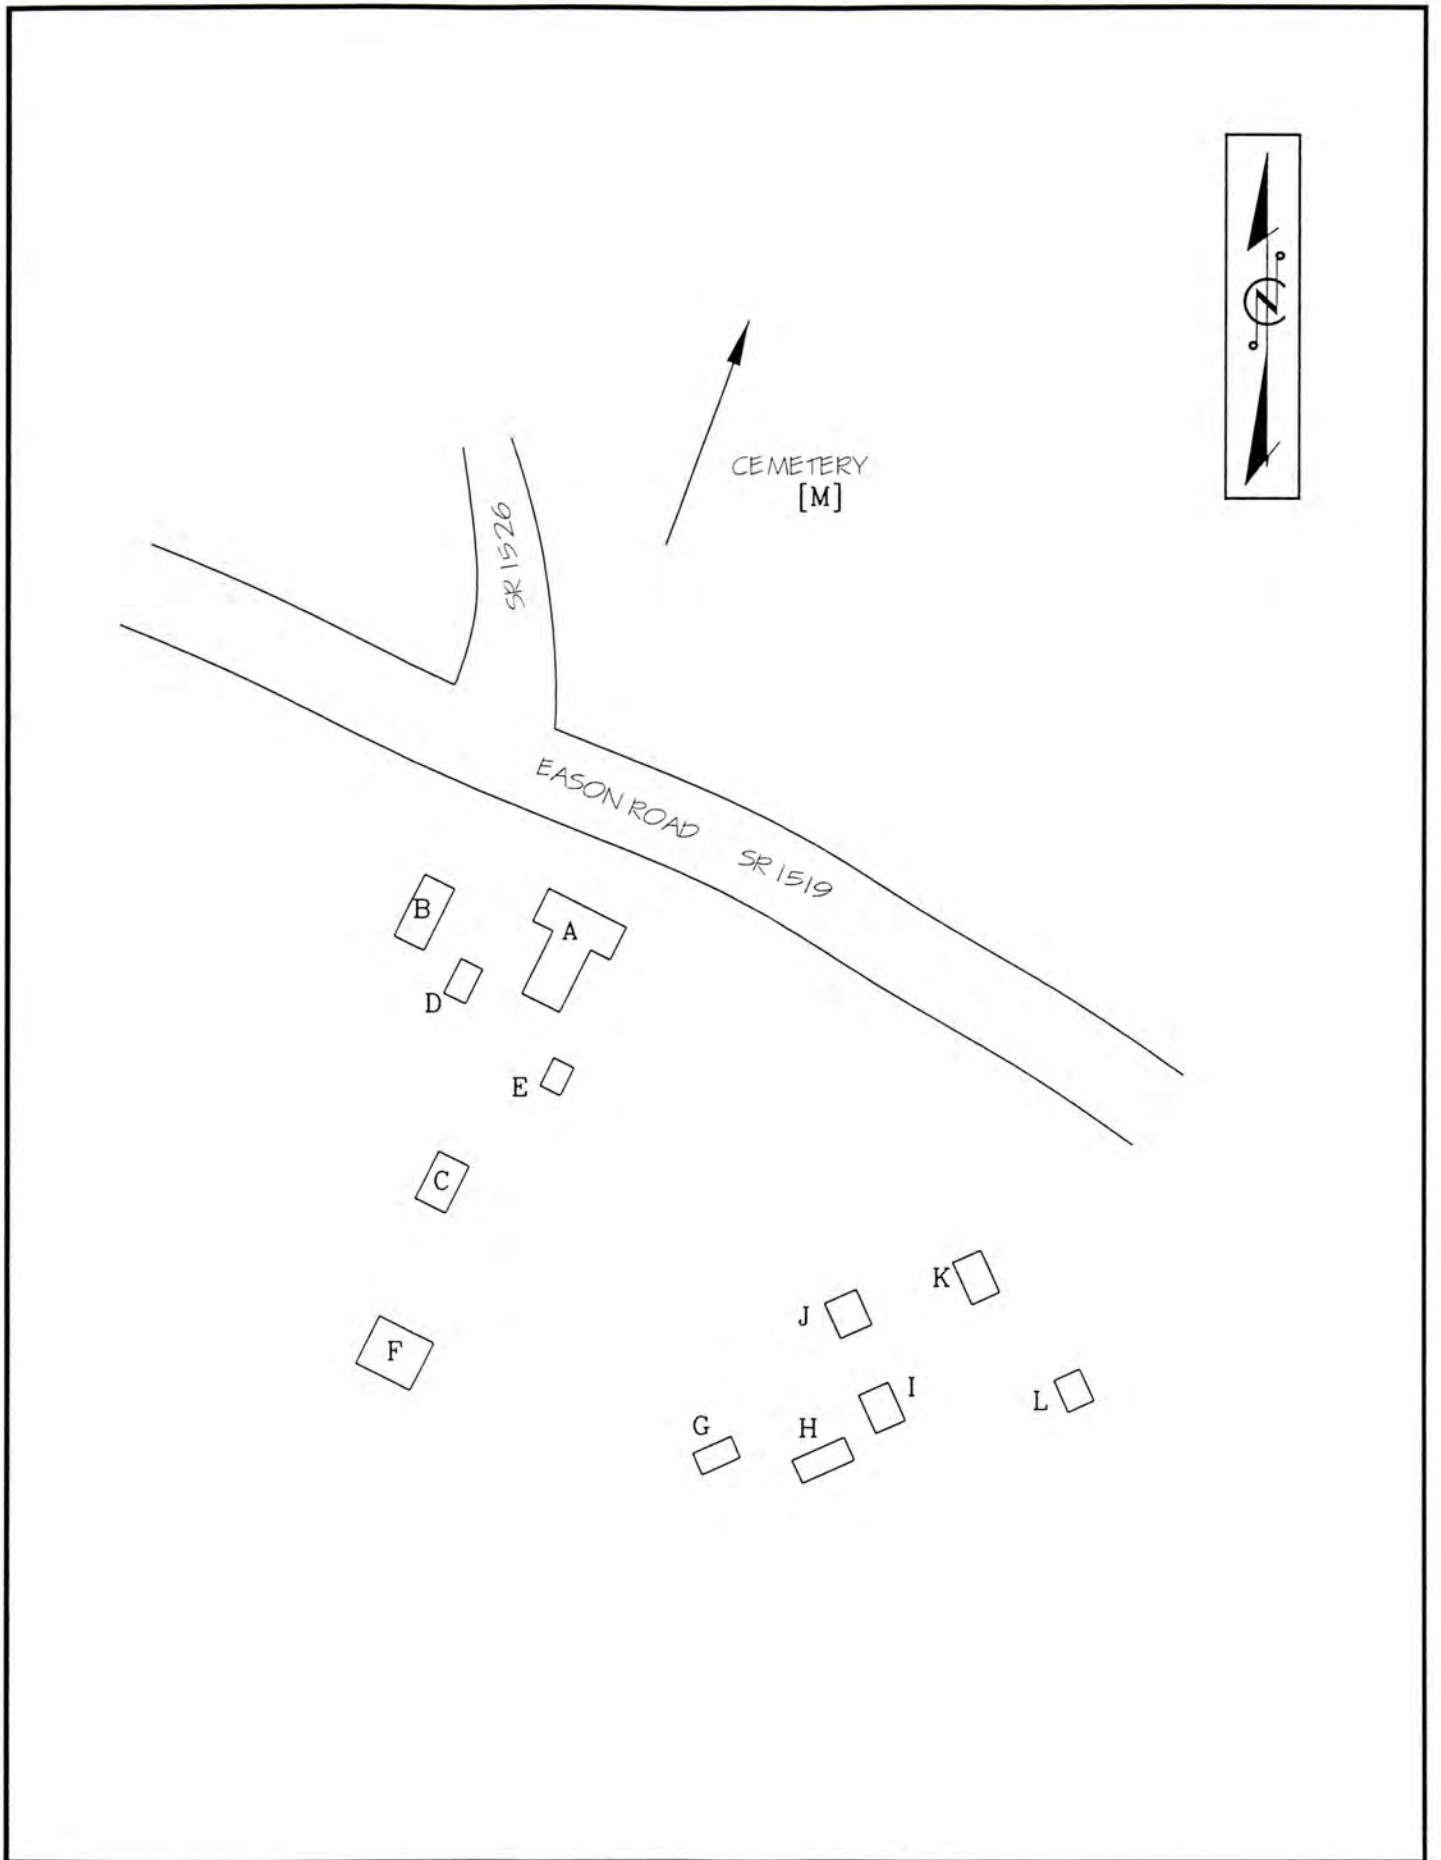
Munfred Brewer House (#17) – Site Plan, Based on Jones, Depicting Location of House and Associated Resources
